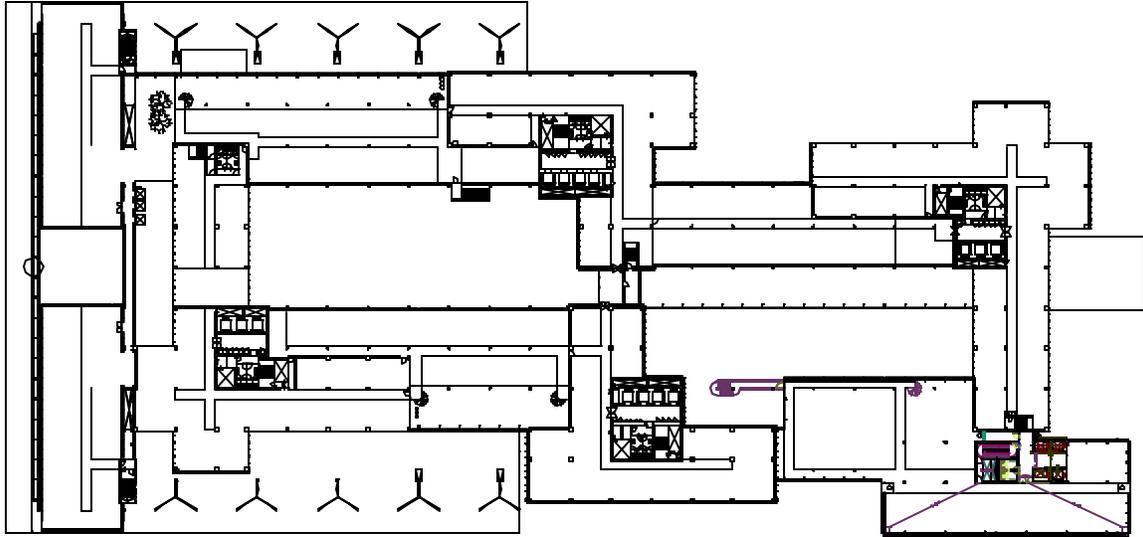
Third Floor Plan of WTC, not to scale (courtesy KPFI)
